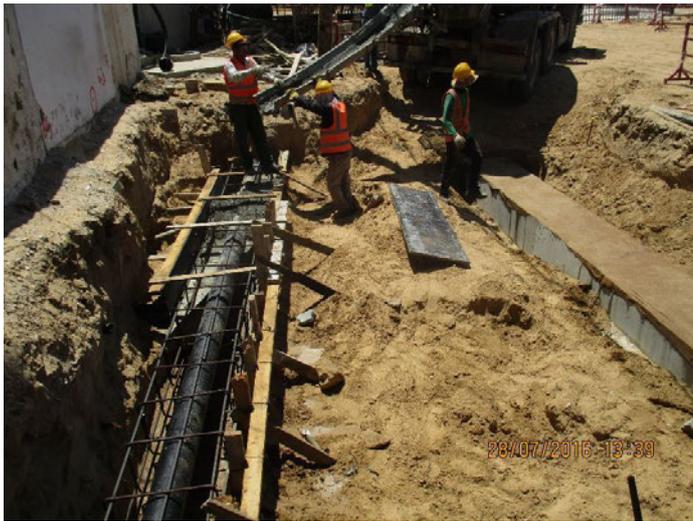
(Taking Samples for Core Test for reservoir's Foundation)
